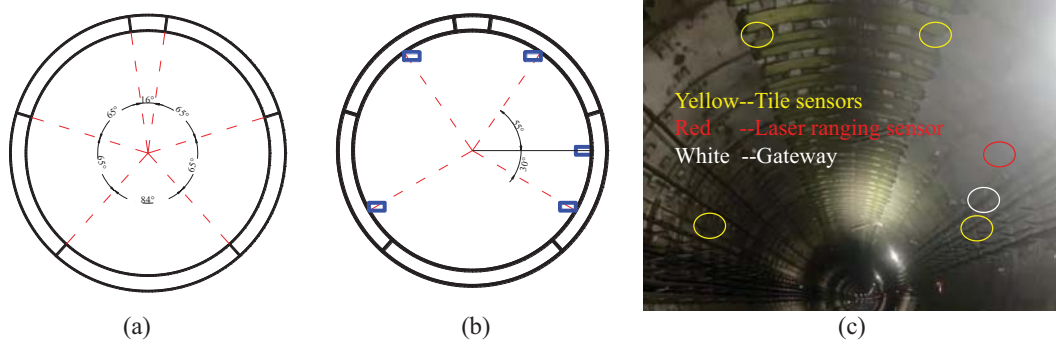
(a) six-segments metro tunnels (b) WSN layout (c) WSN layout on site
